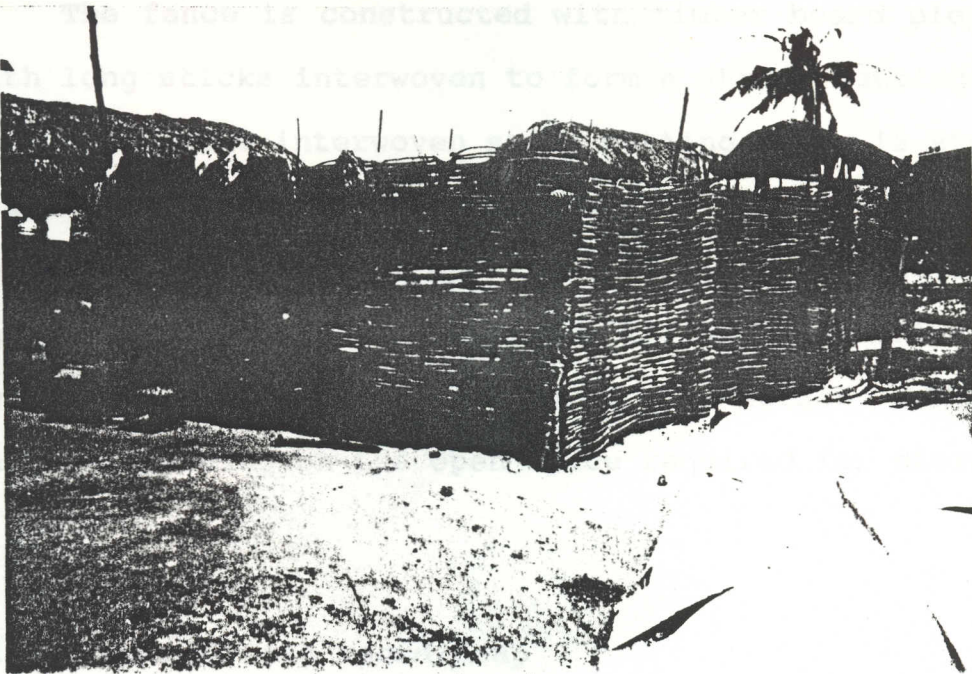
Picture showing a traditional fenced yard storage structure constructed with timber board pieces.
